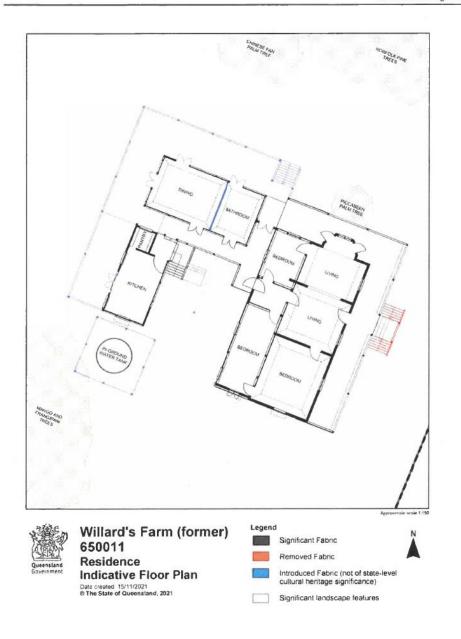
Indicative floor plan - Residence (Queensland Government, 2021)
